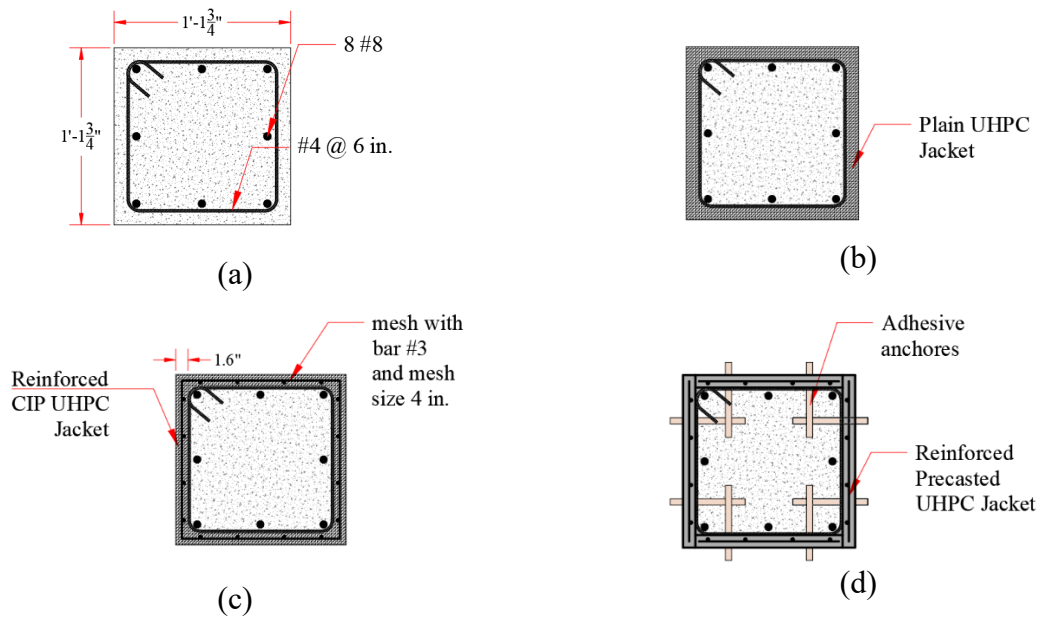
Dimensions and reinforcement details of a) original column, b) column repaired with plain UHPC jacket, c) column repaired with reinforced UHPC jacket, and d) column repaired with reinforced precast UHPC jacket (Hung et al. 2021)
